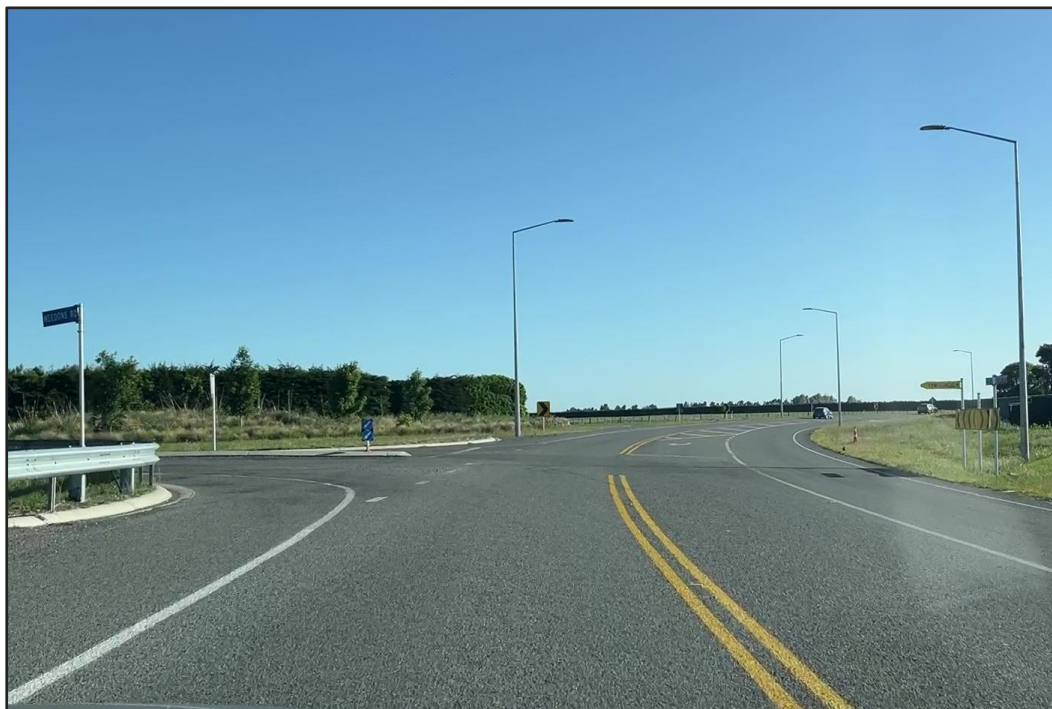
Levi Road/Weedons Road intersection (looking west on Levi Road)
